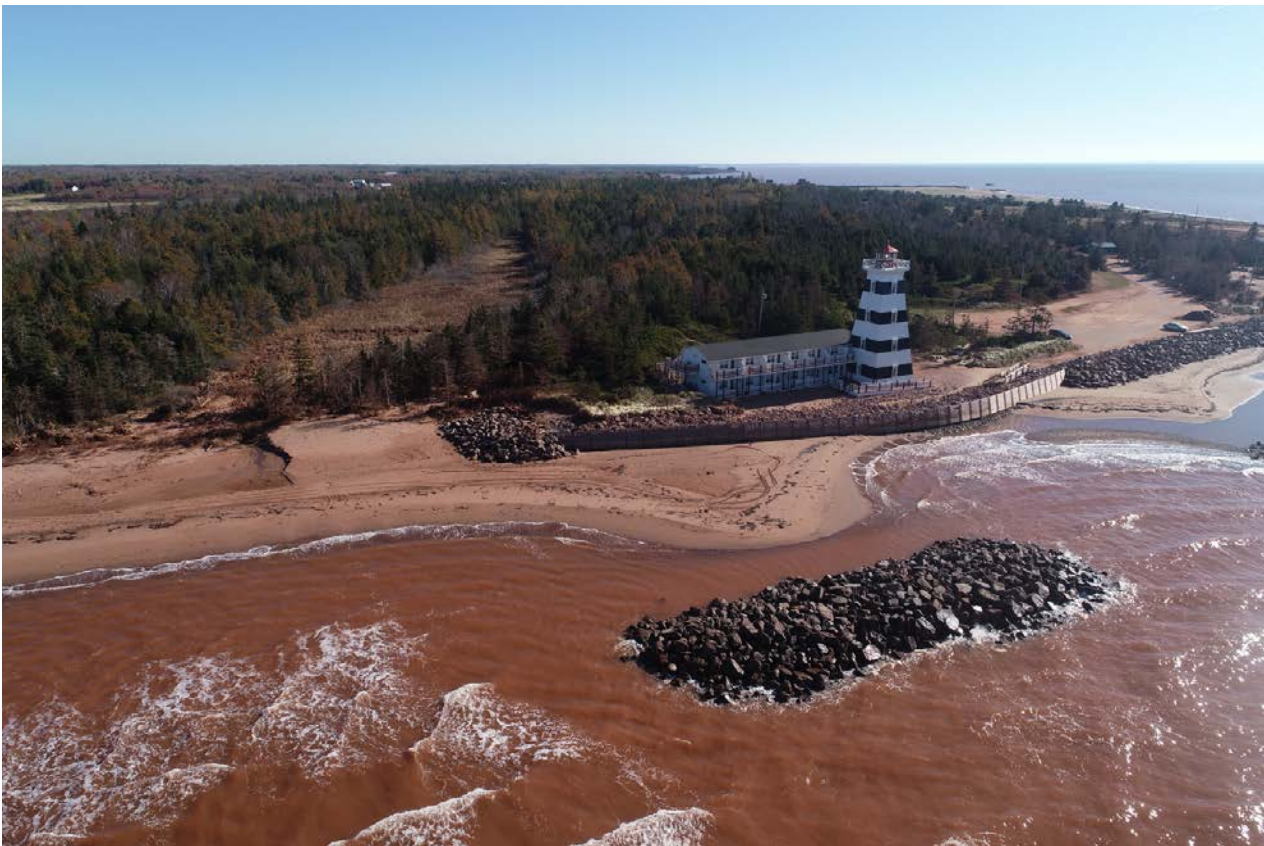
West Point Lighthouse and breakwater after Post Tropical Storm Fiona
